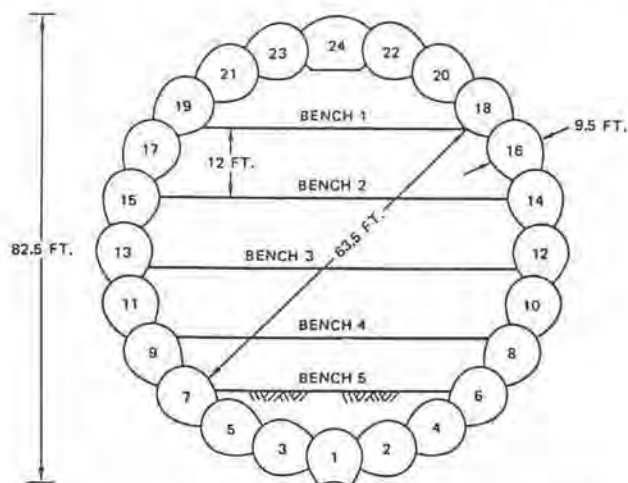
Drift and bench excavation sequence with pairs of drifts excavated from bottom to top followed by bench excavation.
